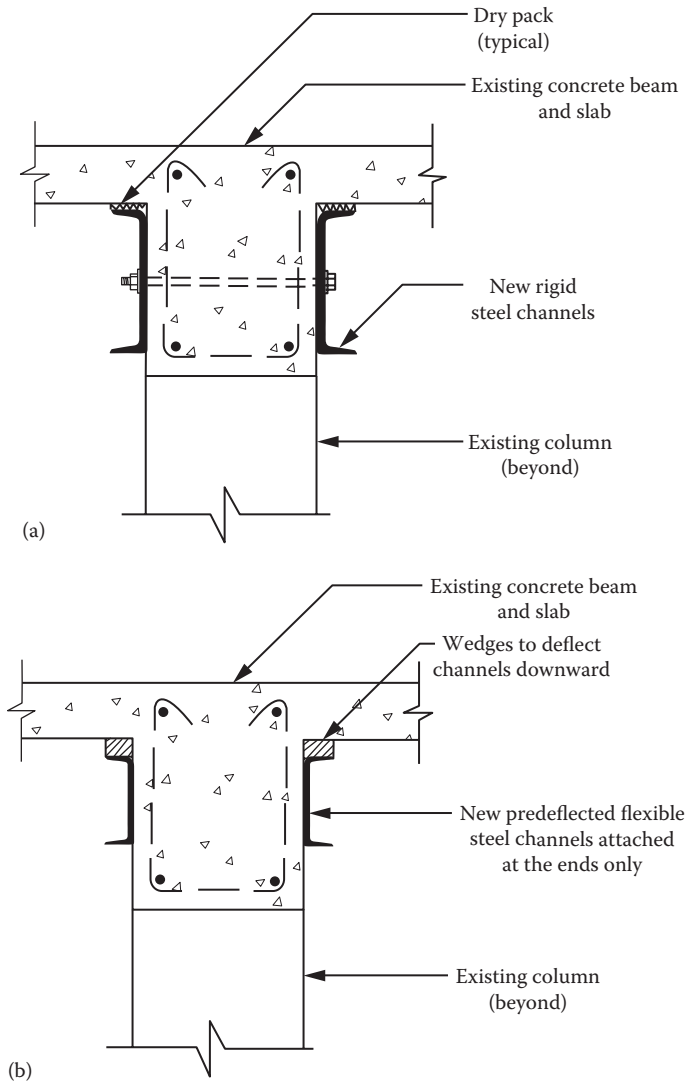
Adding steel beams on each side of an existing concrete beam. (a) Rigid channels designed for strain compatibility; and (b) flexible channels deflected downward to remove some load from the existing beam.
